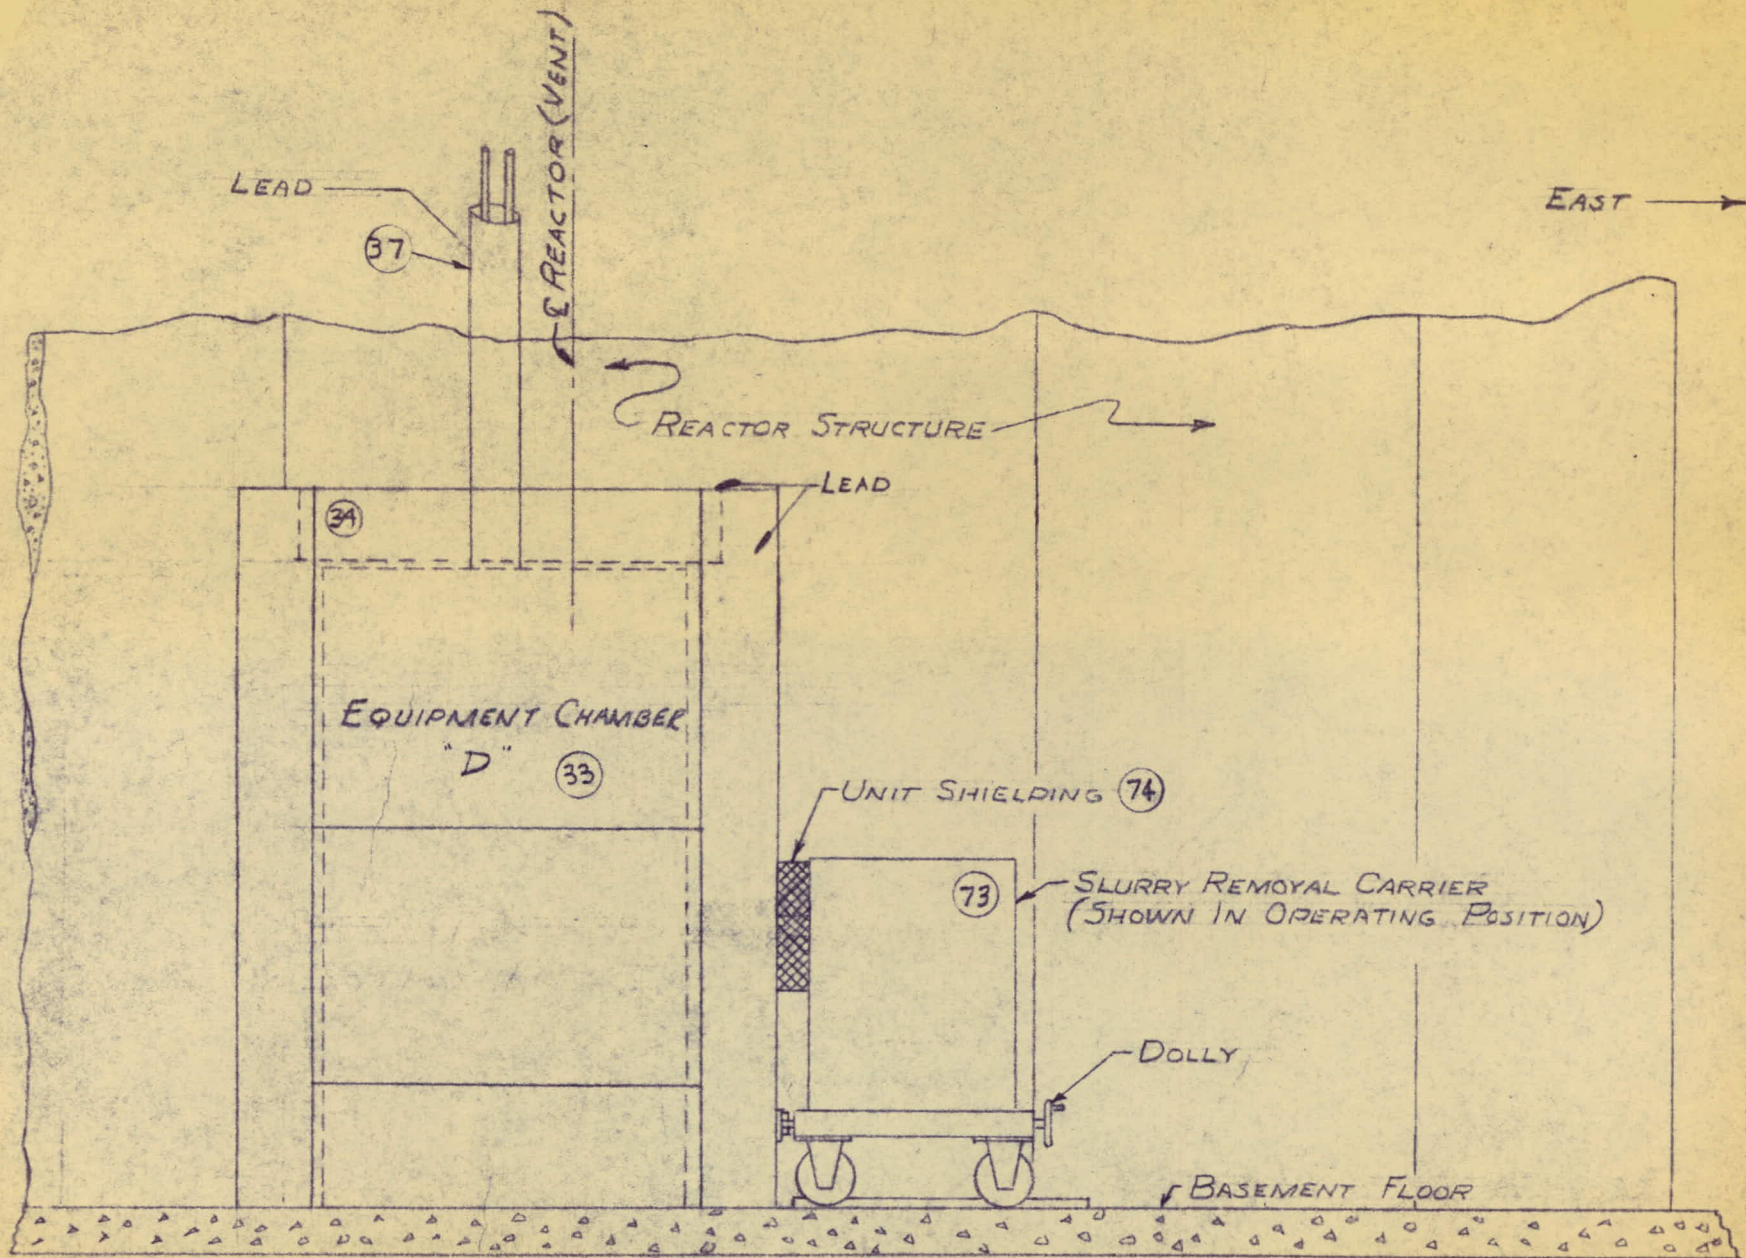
ELEVATION OF EQUIPMENT - BASEMENT FLOOR - ORR
